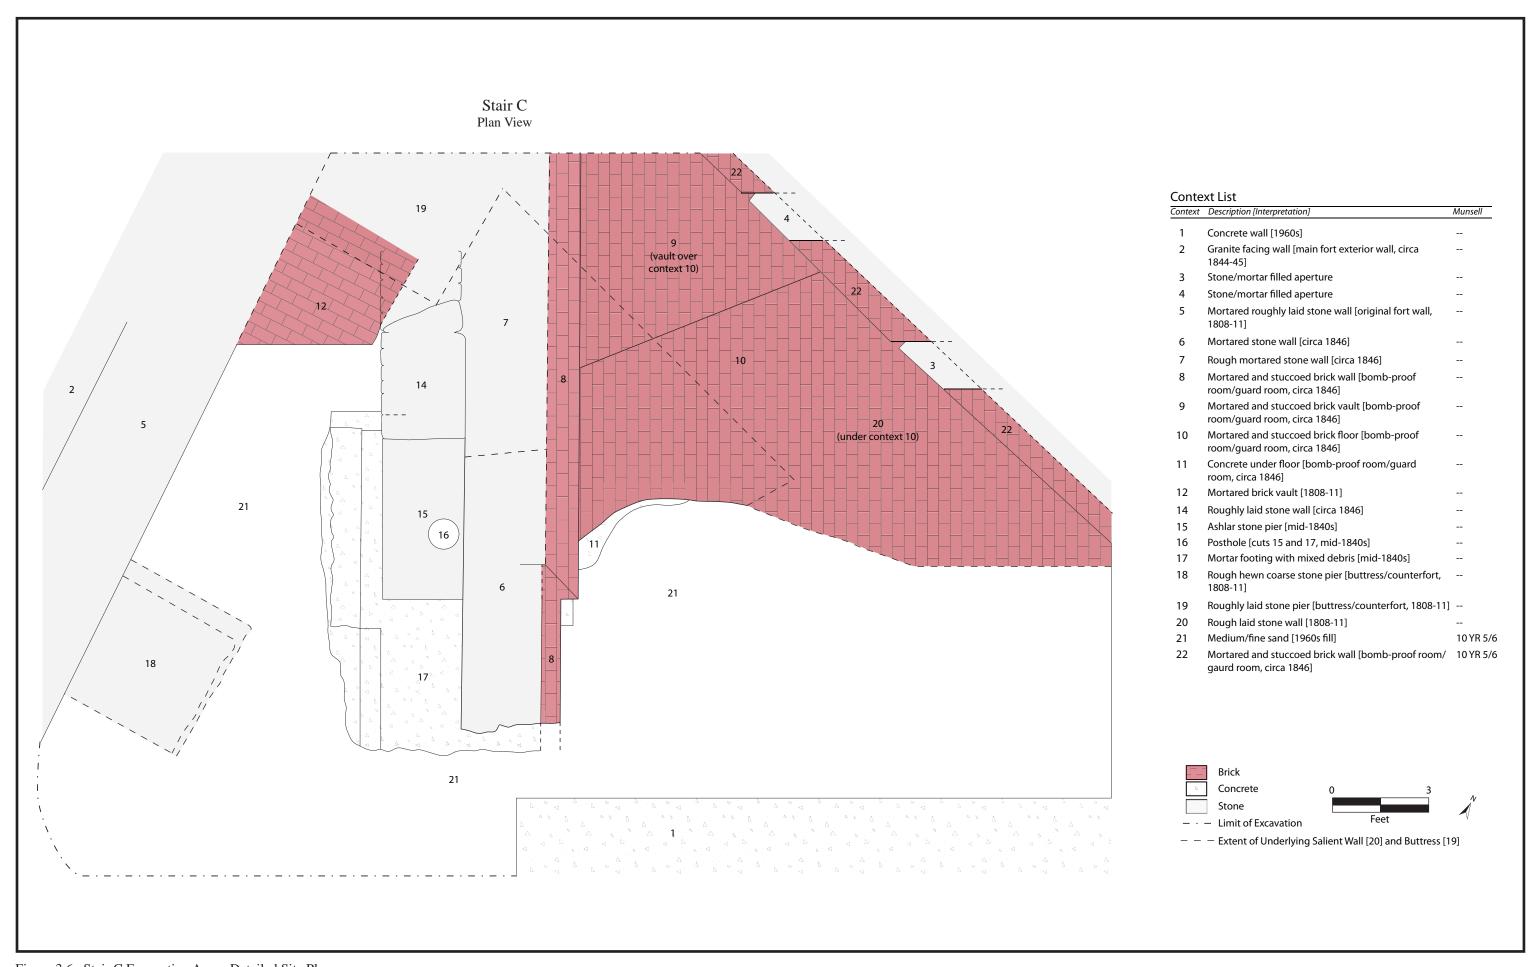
Stair C Excavation Area: Detailed Site Plan.
